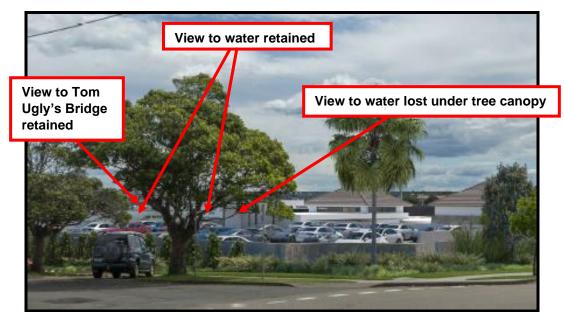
Proposed montage - Intersection of Plimsoll and Wellington Streets (Source: Innovate, Revision F)
